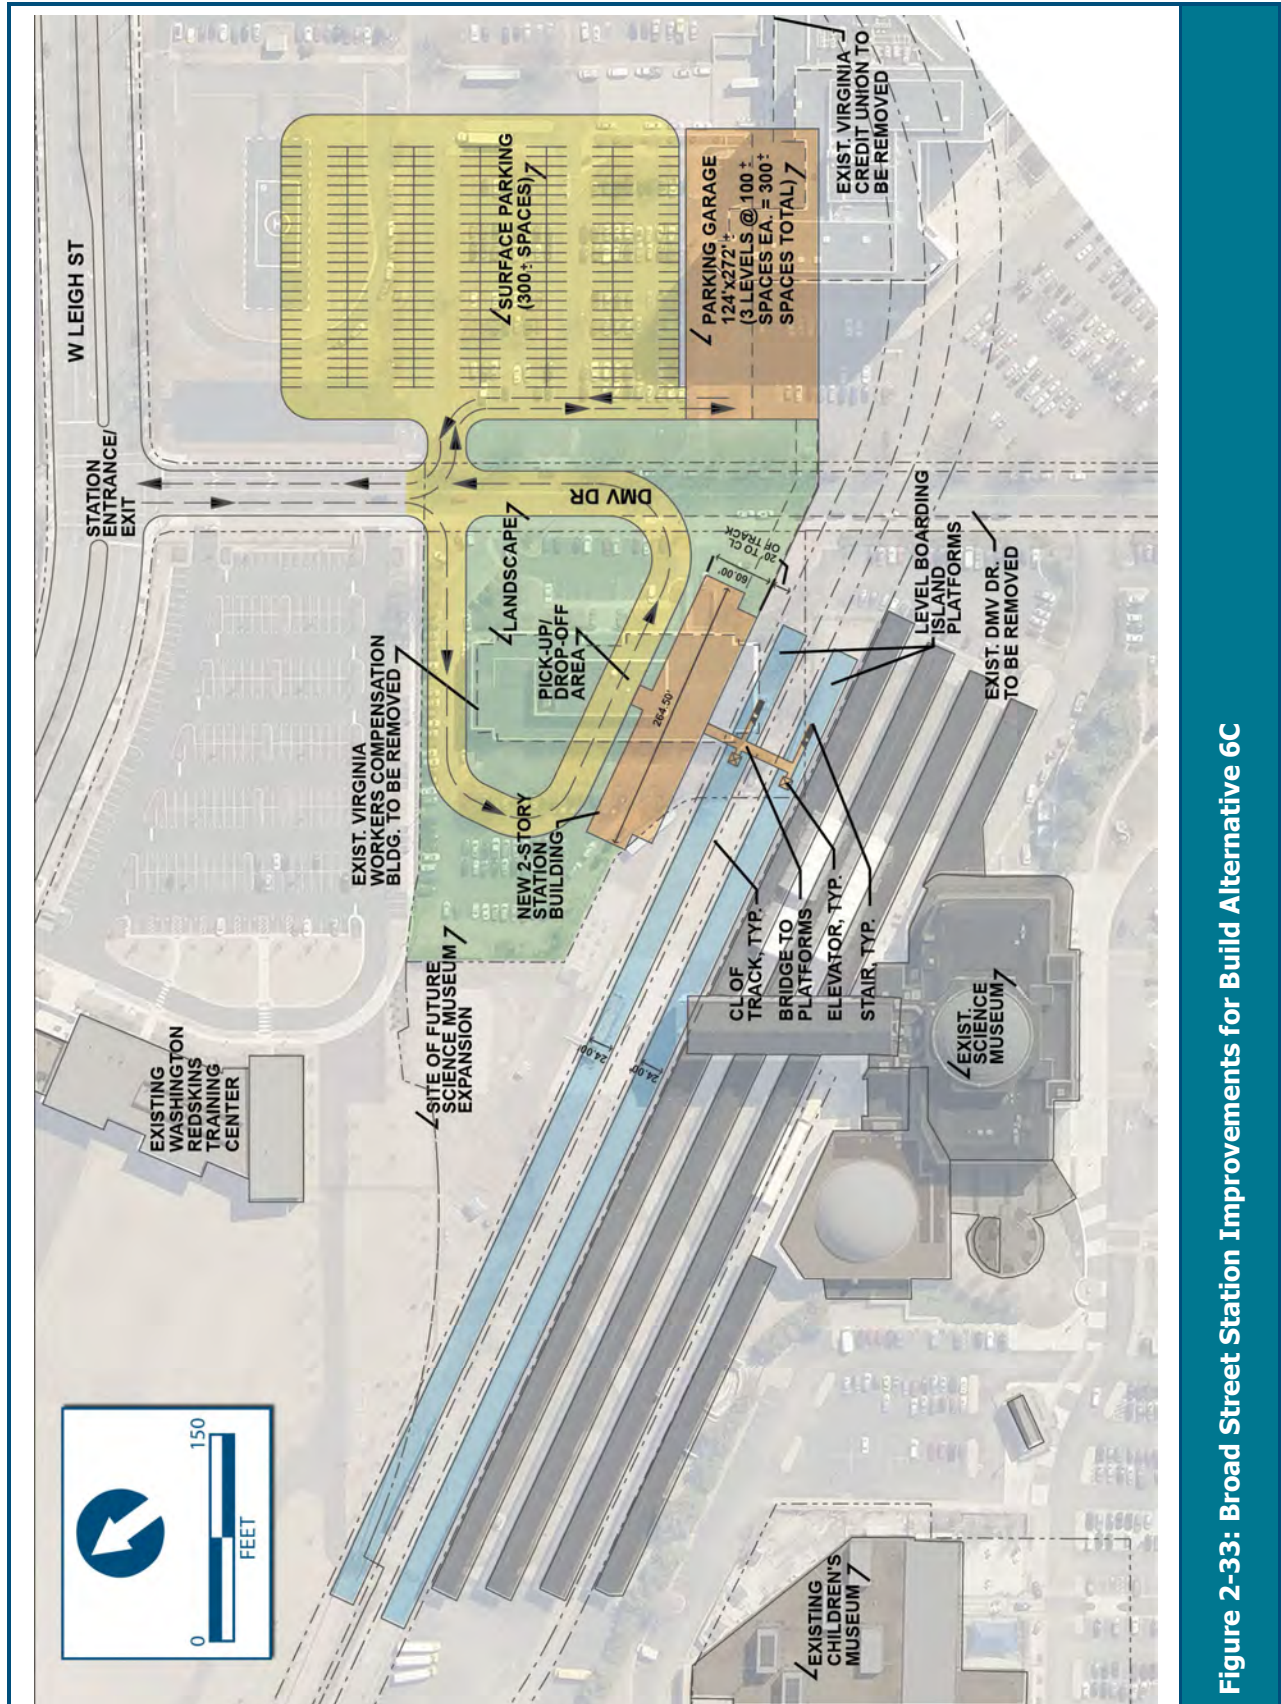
Broad Street Station Improvements for Build Alternative 6C
